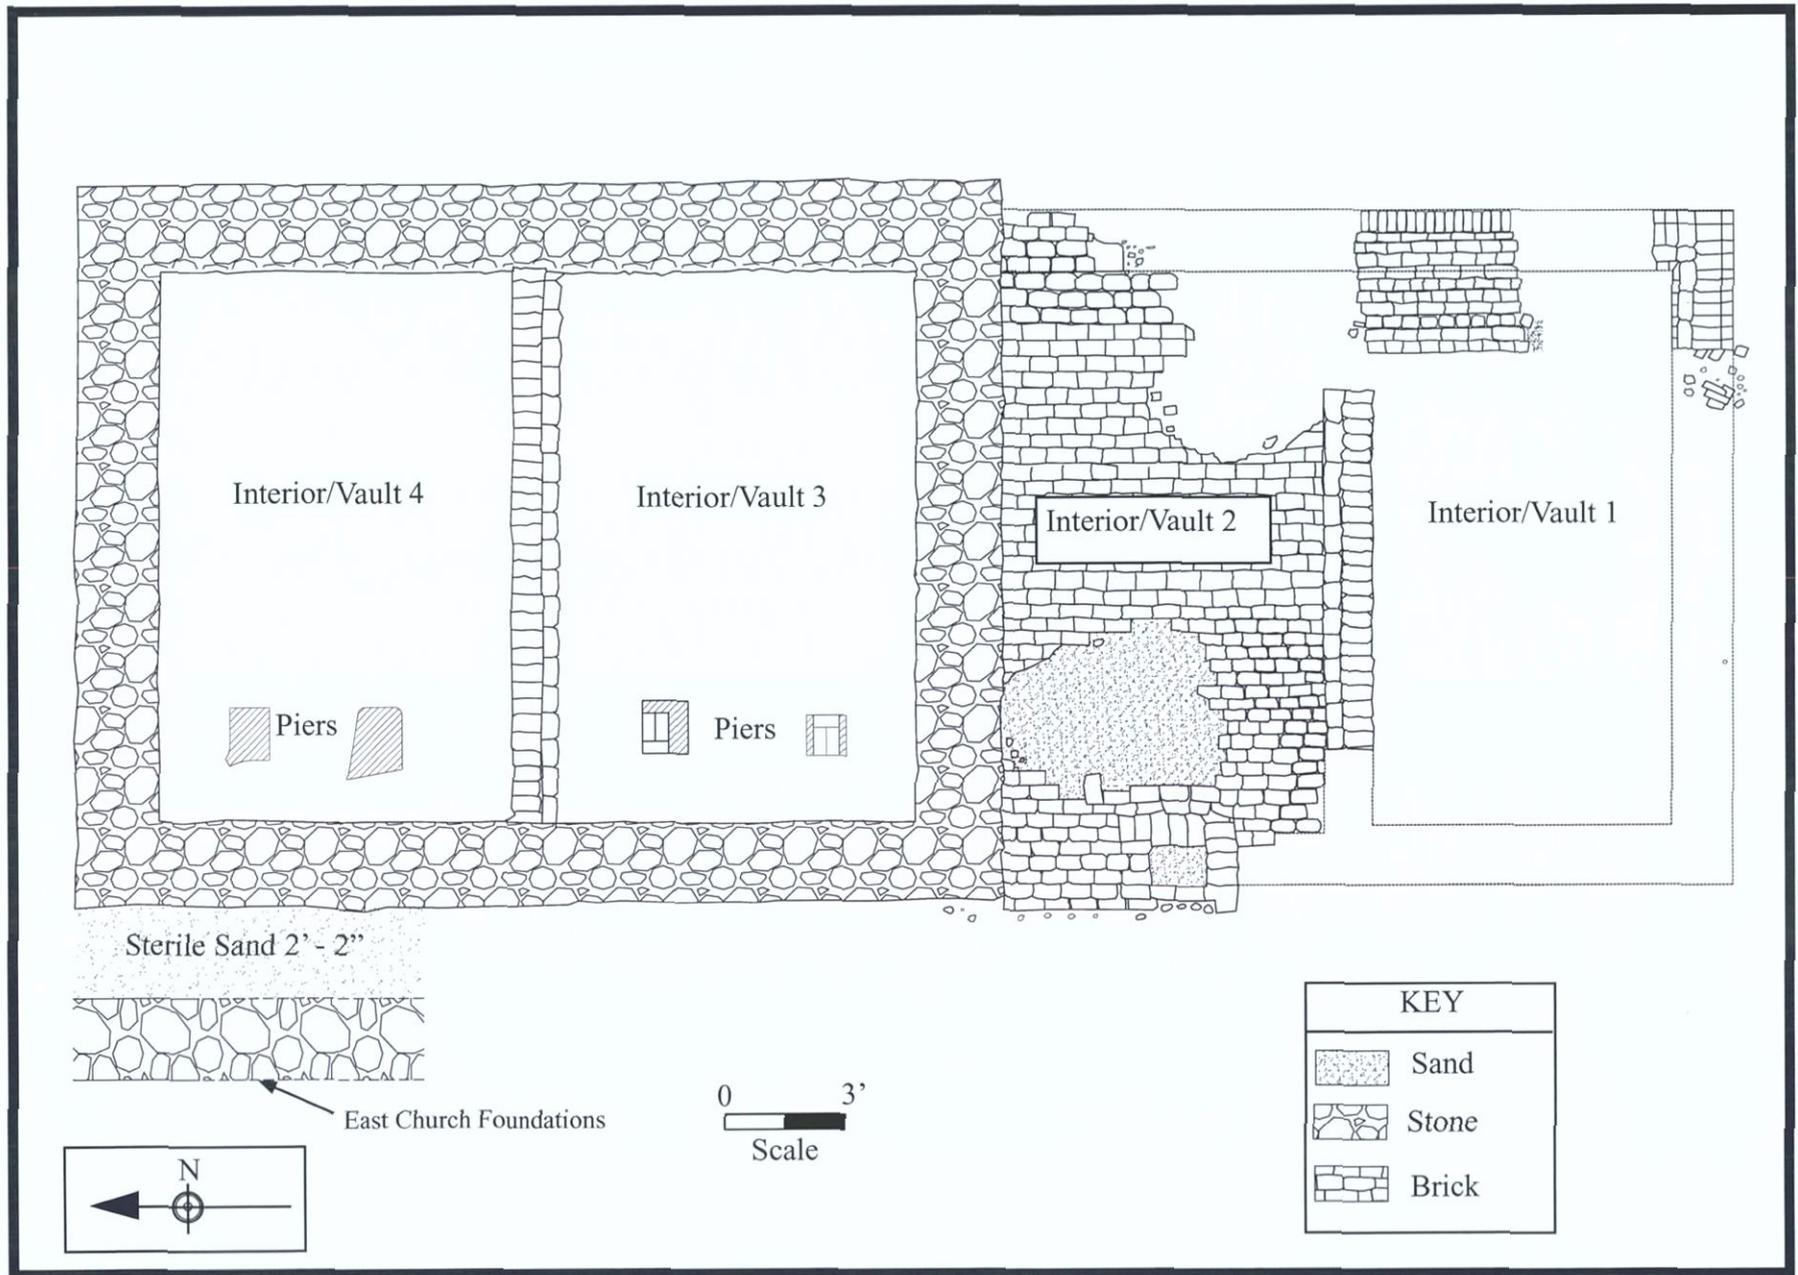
Plan view of the Spring Street Church burial vault structural remains.
